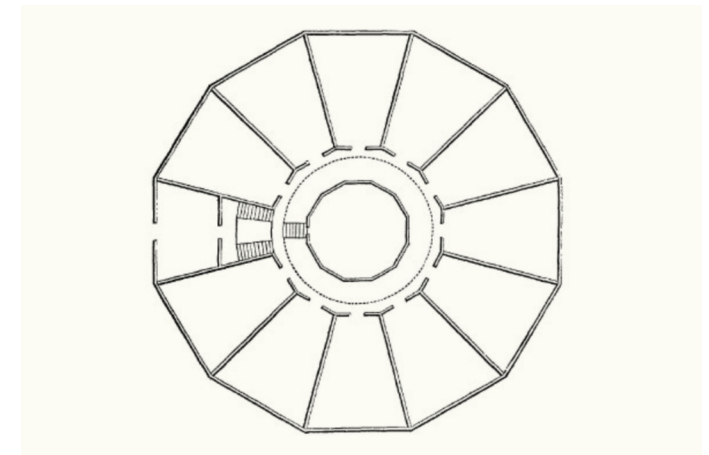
Floor plan of a Panopticon building (Bentham, 1812)
